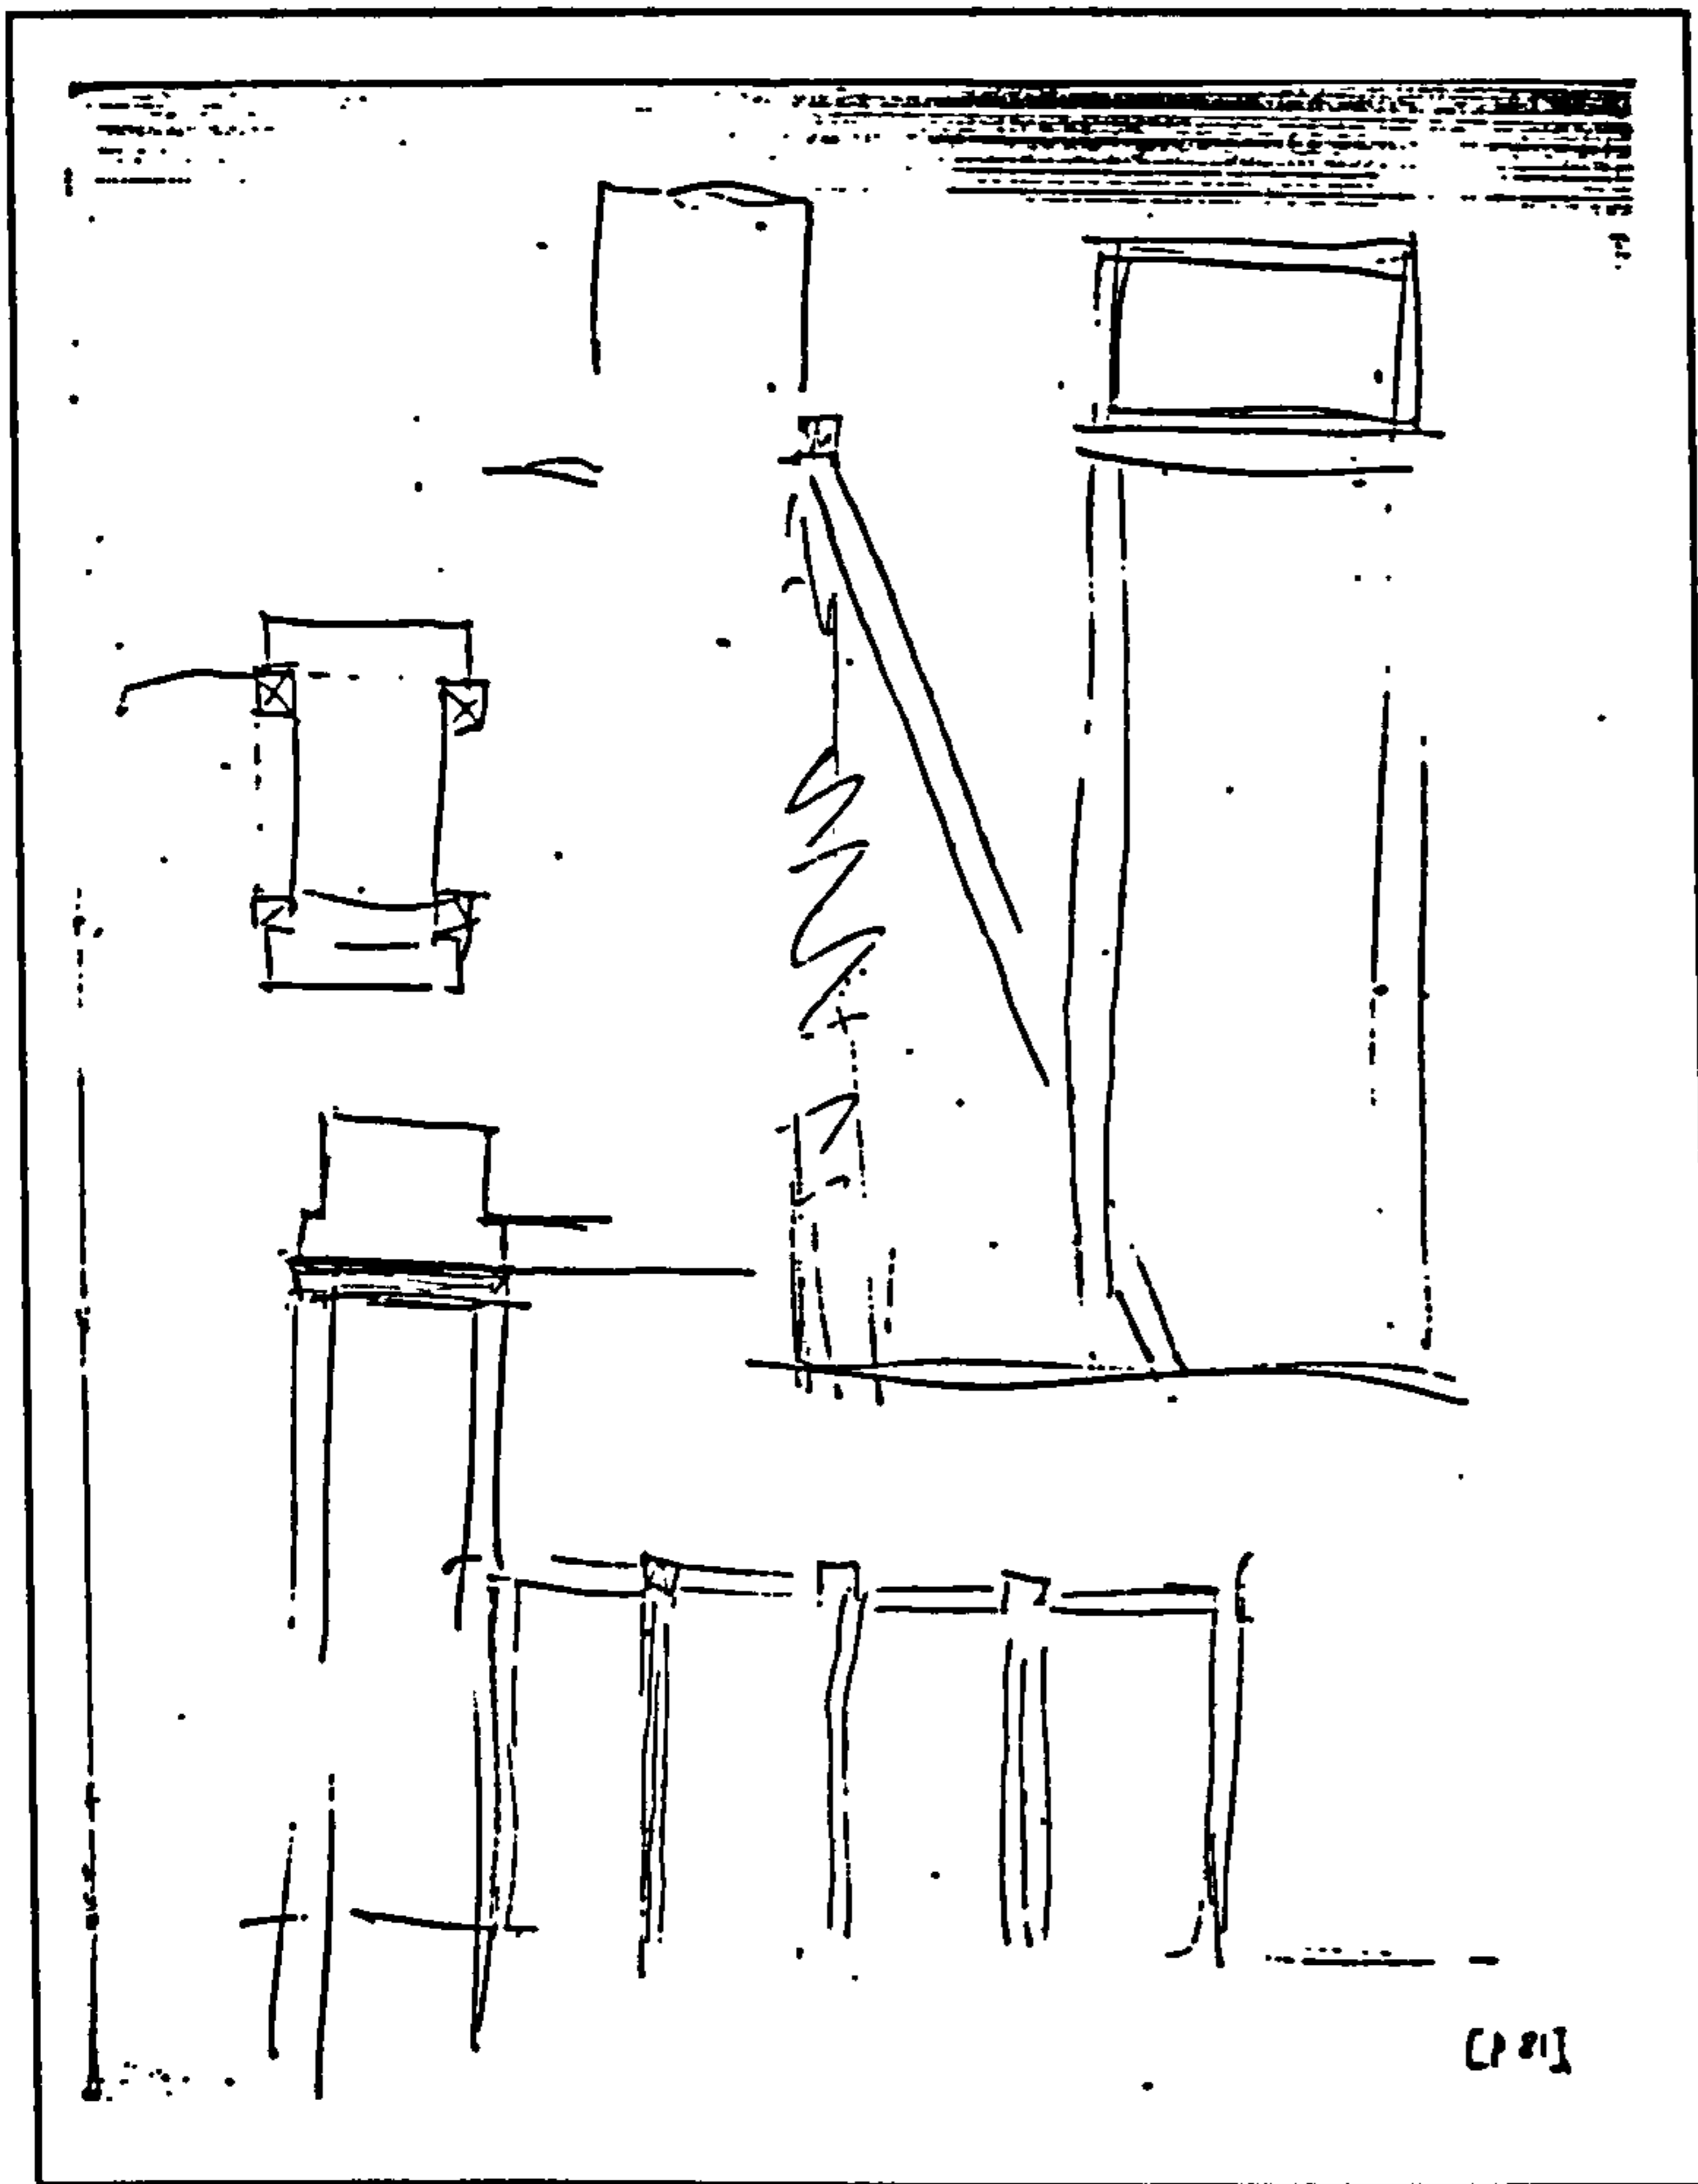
Sketch plan and elevation for the first timber support frame of the Hall of the Double Axes. Theodore Fyfe, Notebook 1901, p. 81.
